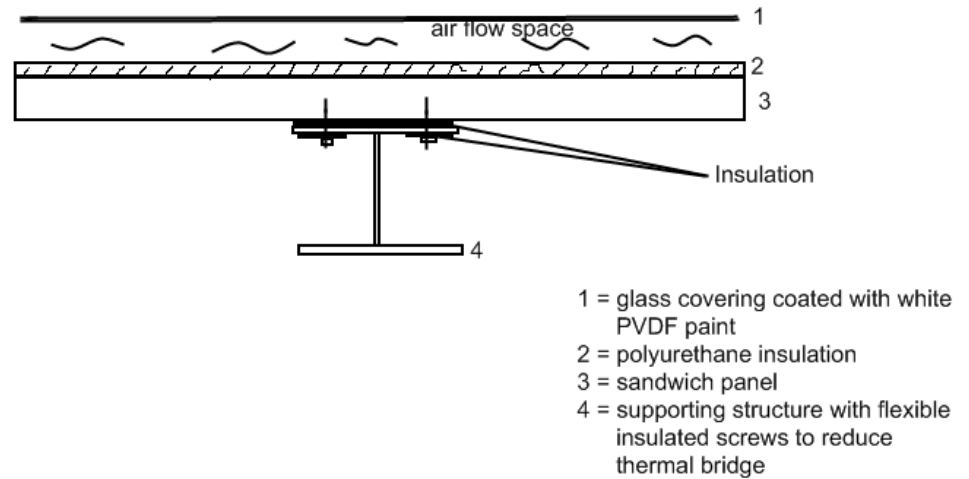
structural arrangement showing glass cover coated with white PVDF paint
